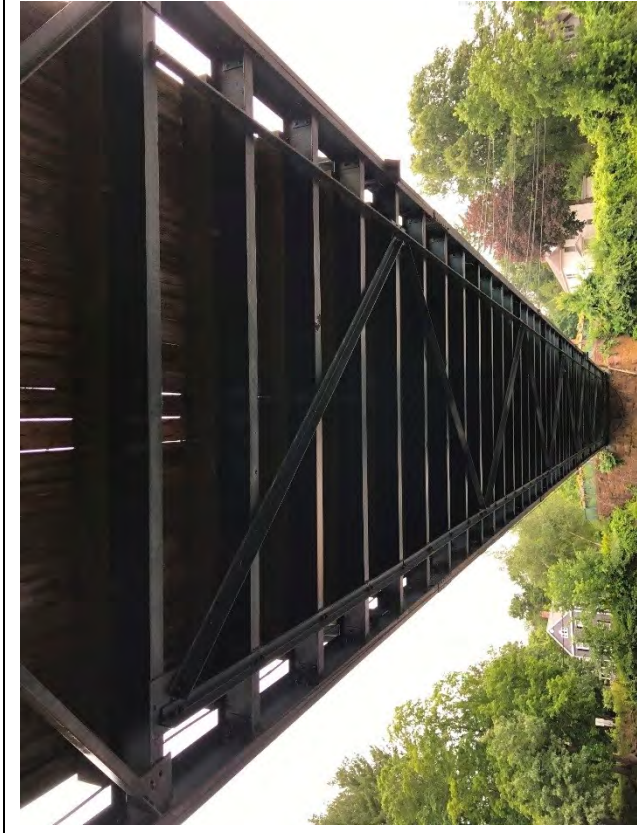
View of the underside of deck and framing. Note the gaps between the deck planks.
